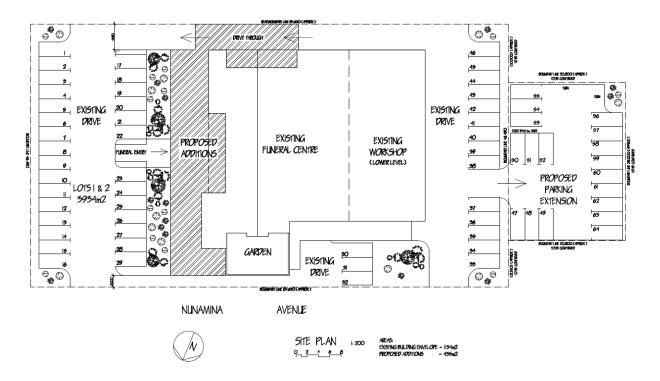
Proposal site plan (Graham Hills & Partners Architects) – 23 Pinkard Street is the small parking extension to the west of the existing funeral home.
